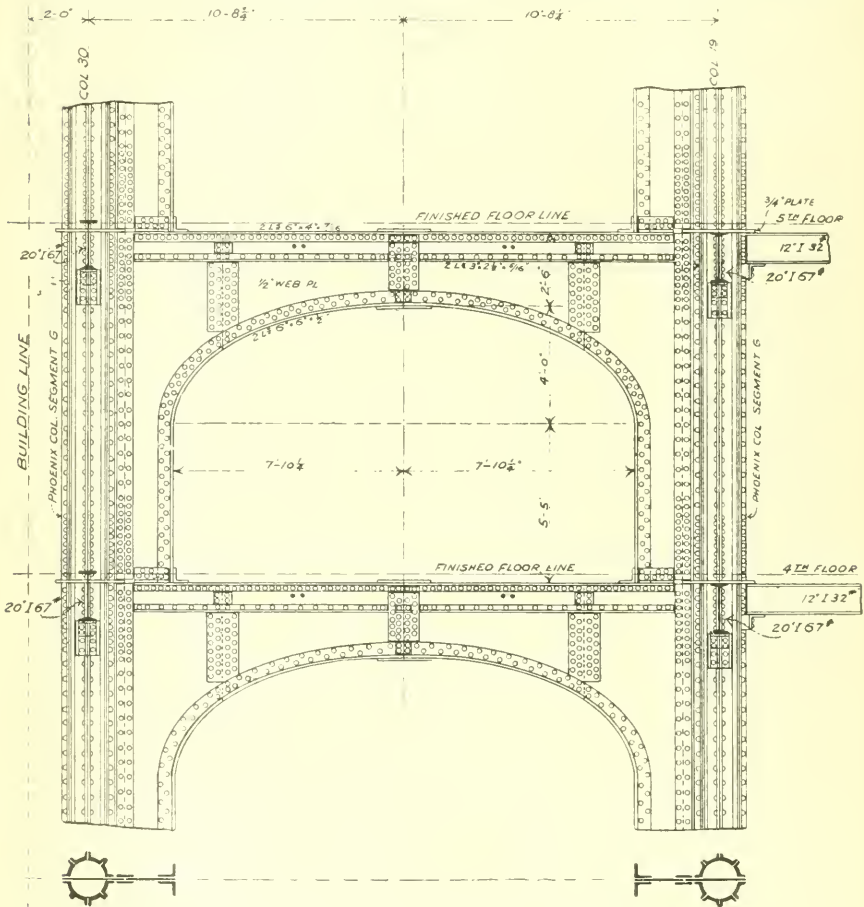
PORTAL BRACING, OLD COLONY BUILDING, CHICAGO.
